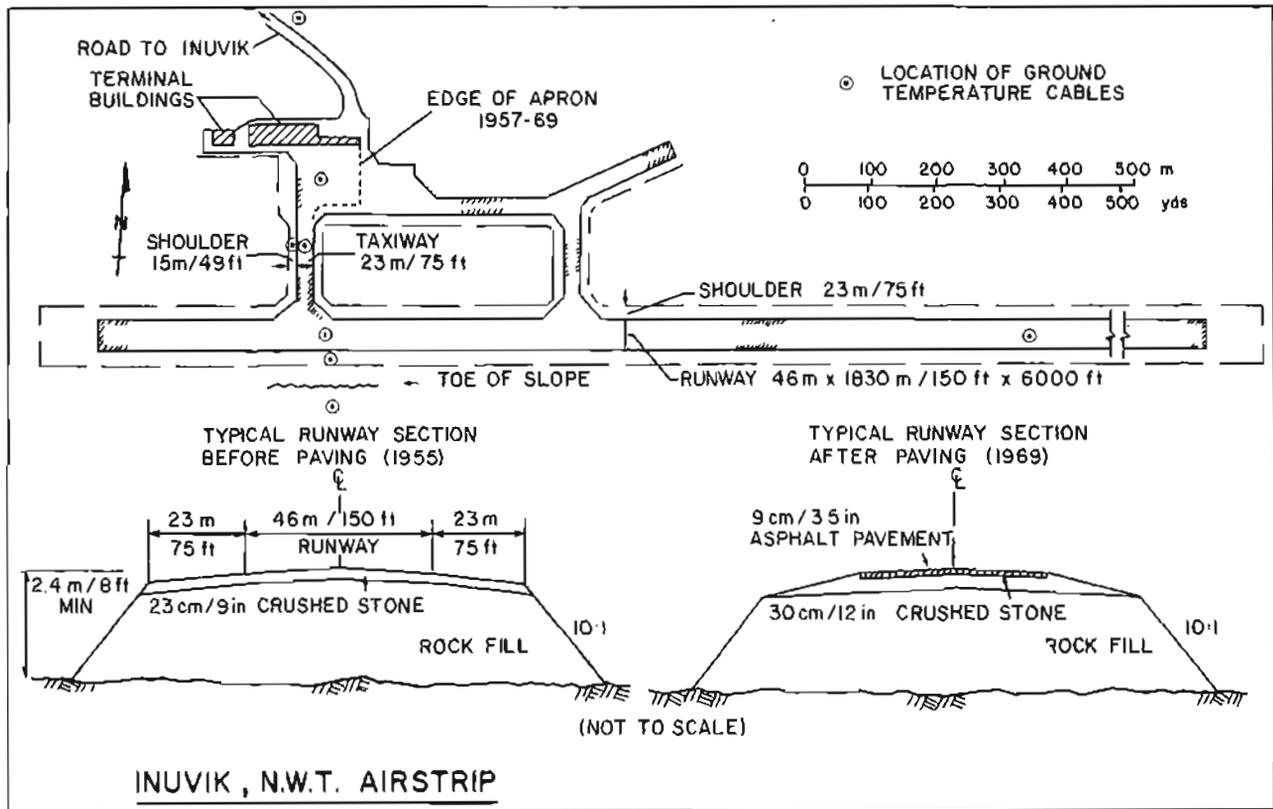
Plan showing the general layout of the Inuvik airstrip and typical sections of the runway before and after paving (Johnston, 1982).
